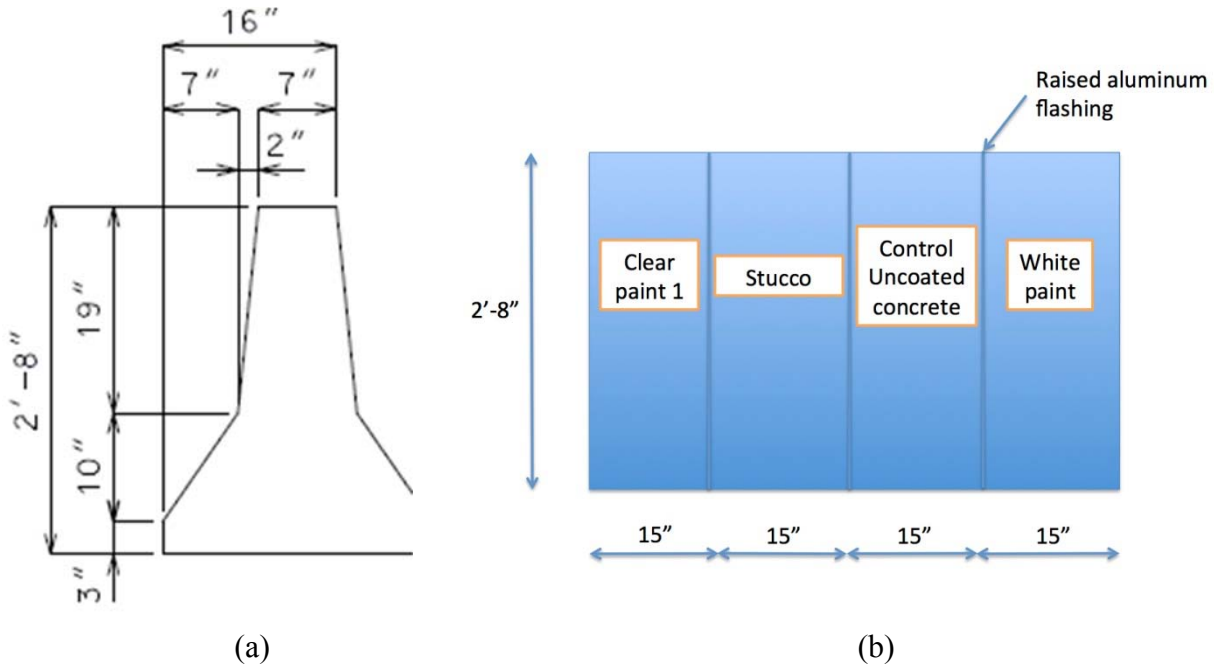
Concrete barrier specimen: (a) side elevation; (b) front elevation
